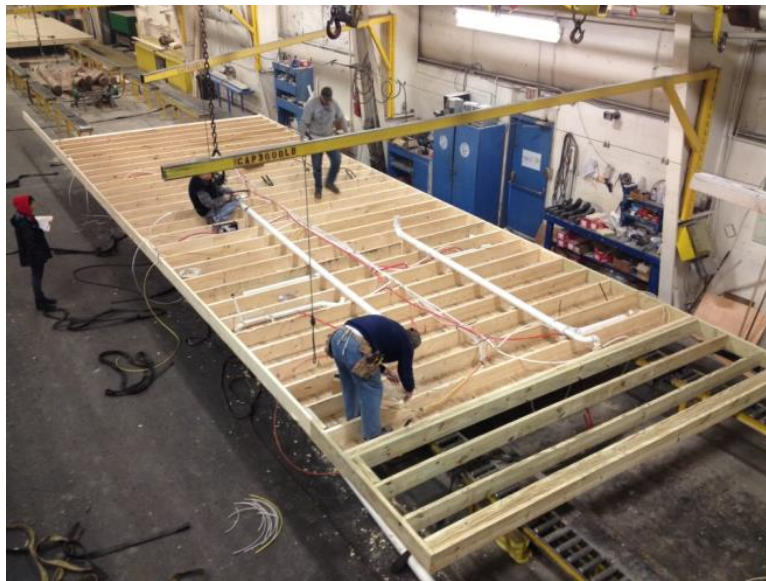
Floor of “A” section inverted for electric and plumbing work
